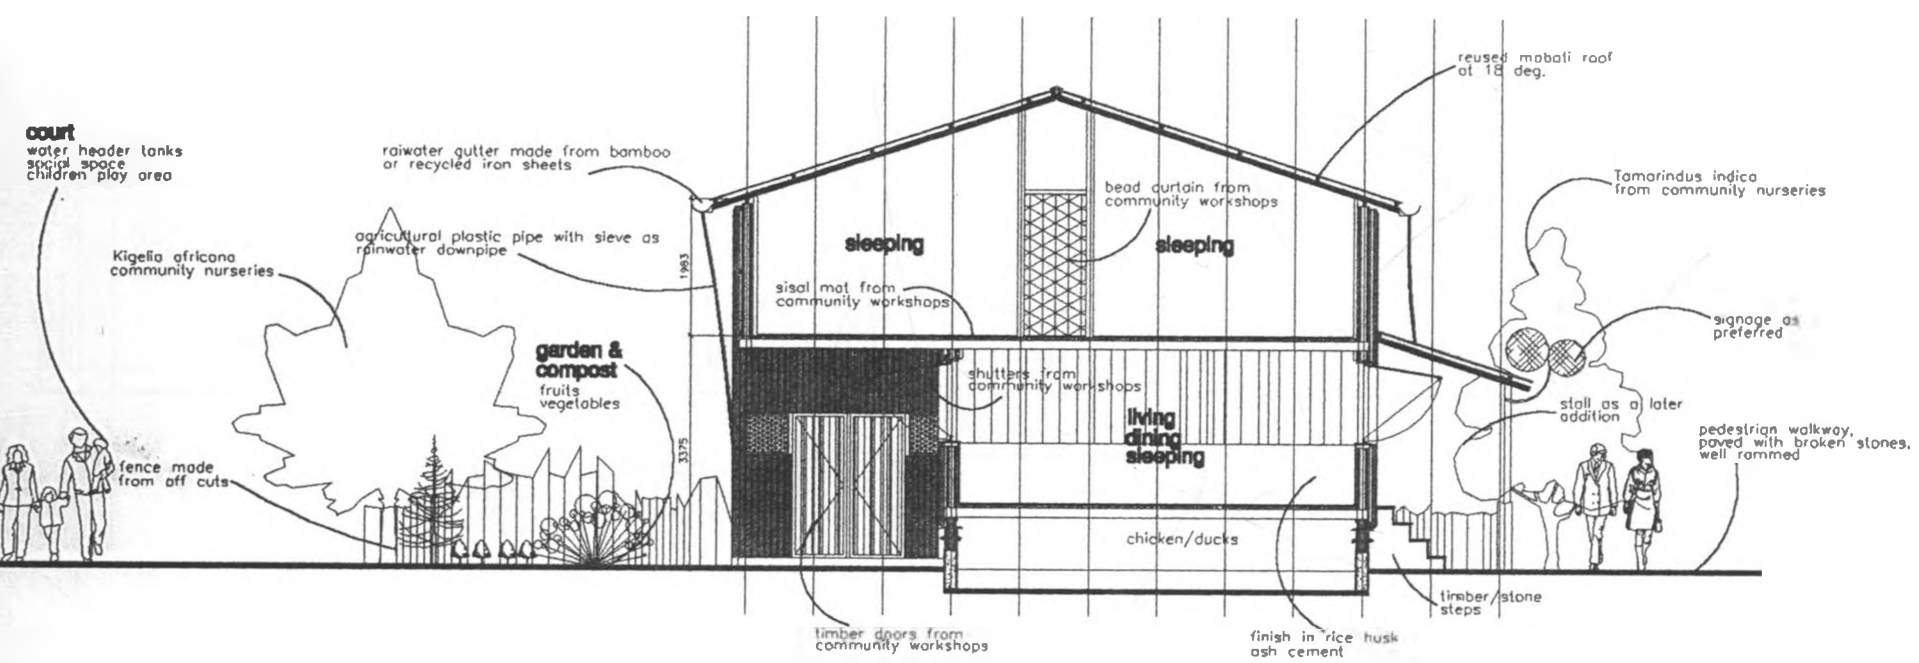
DWELLING UNIT -TYPICAL SECTION-ELEVATION
